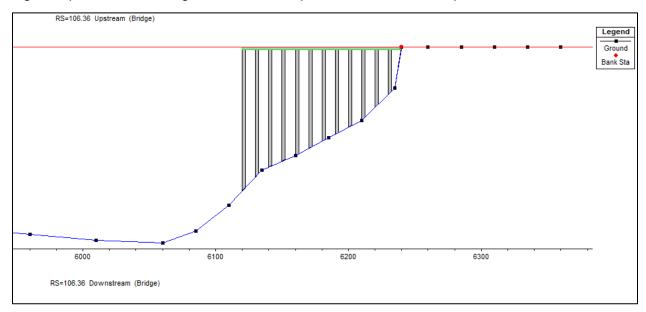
provides an enlarged cross-section profile of the wharf and piers.
